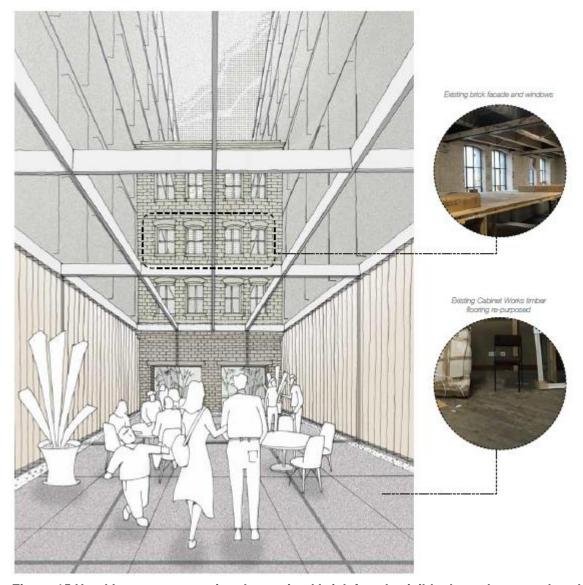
Hotel Lounge, preserving the retained brick facade visible through a new glazed roof
